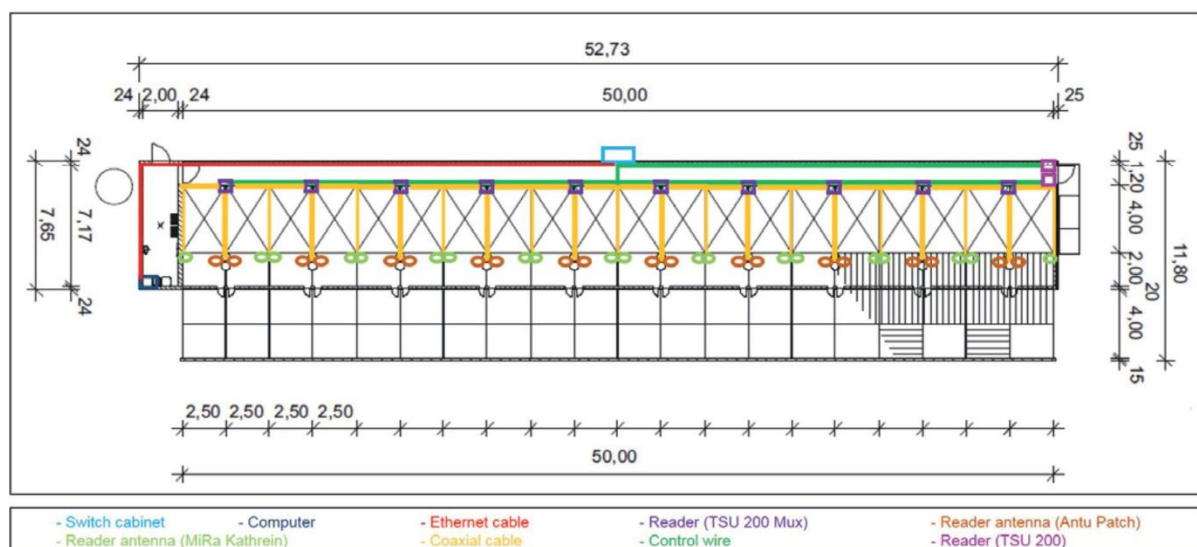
Plan elevation of example barn A for 400 fattening pigs with schematic illustration of the inbuilt RFID system hardware components (© KTBL 2015a, adjusted)
